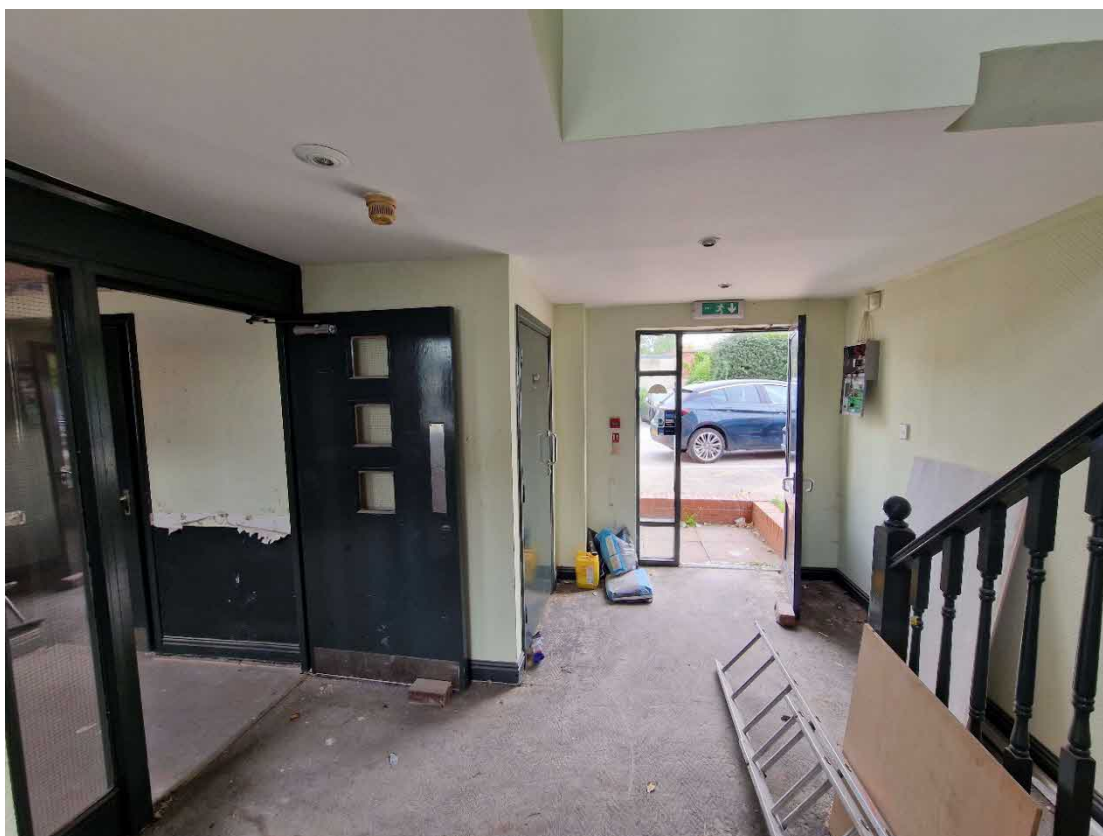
Rear doorway to the car park and glazed panel and door to the restaurant (left)
